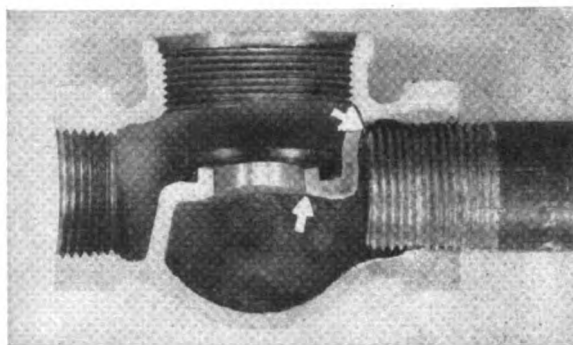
Distortion of valve seat due to excess threads on pipe.
